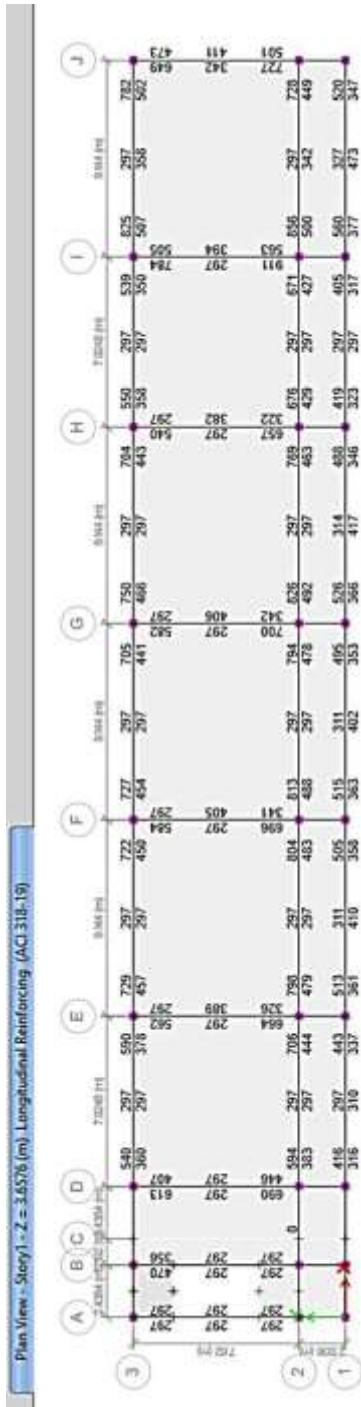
Longitudinal Reinforcement Area of 1st floor beam
